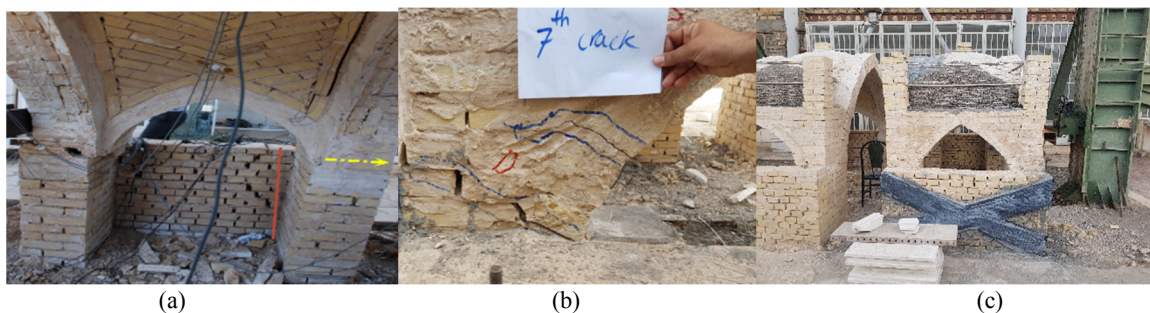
(a) The unreinforced structure before loading; (b) Reinforced structure after loading; (c) A view of the masonry arch (vault and spring).
